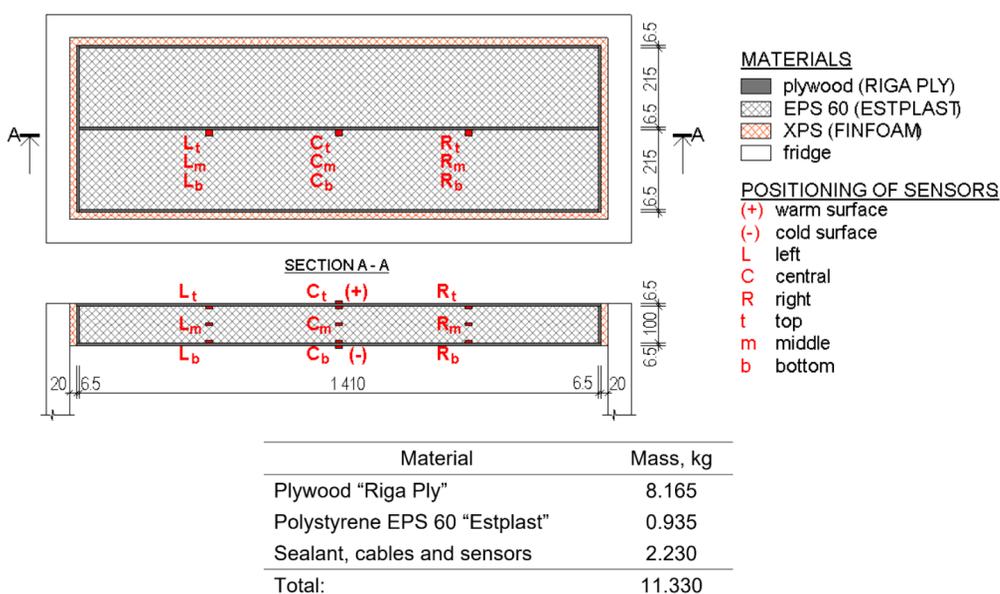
Dimensions of ribbed plate, positioning of the sensors and initial mass of the plate and its components.
